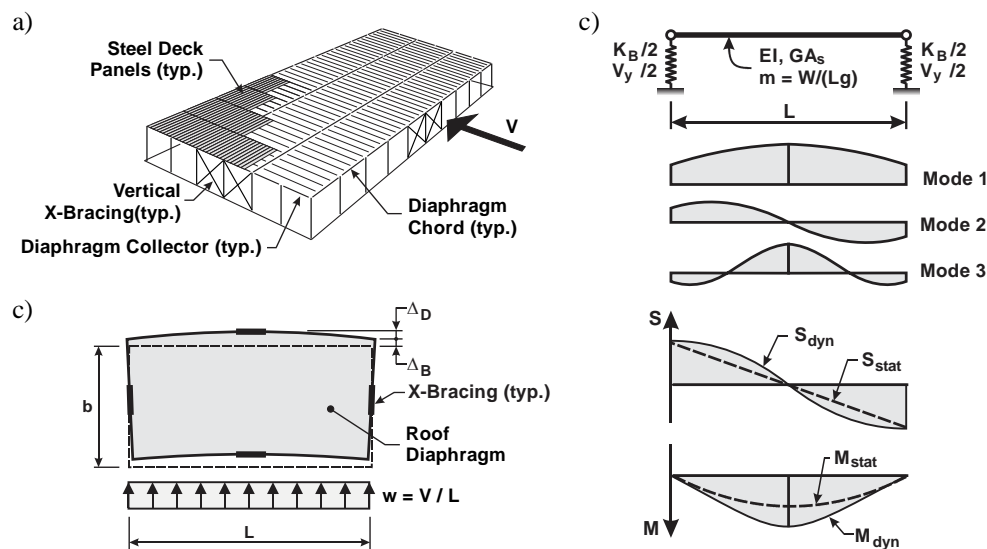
Single-storey steel building with flexible roof deck diaphragm and perimeter vertical bracing:
